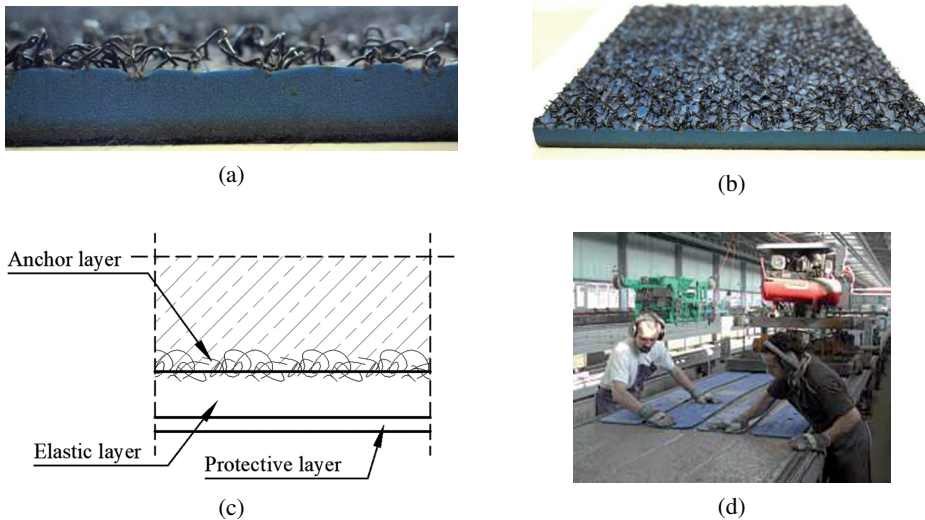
USPs used on Austrian railways: (a) anchor layer – side view; (b) anchor layer – top view; (c) anchoring scheme; (d) placing USPs with an anchor layer on the unset concrete of the support [21]
